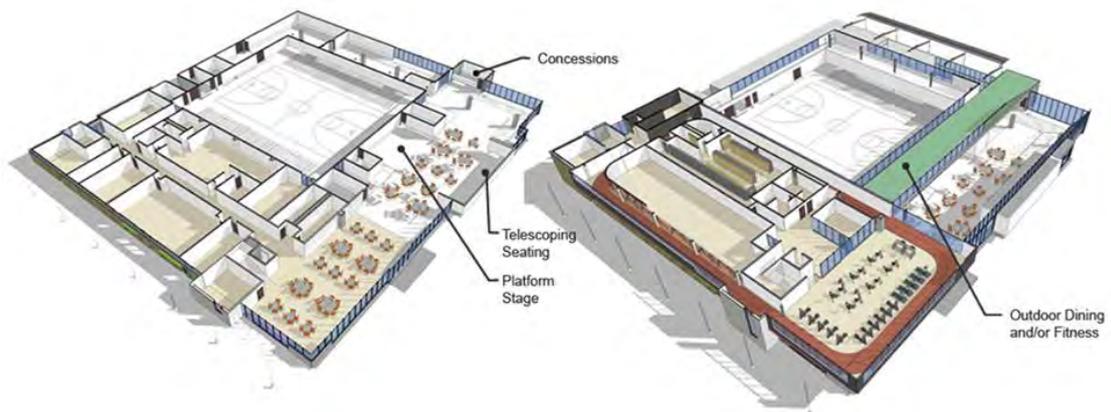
Plans of Campus Commons Building (dlrgroup.com)
